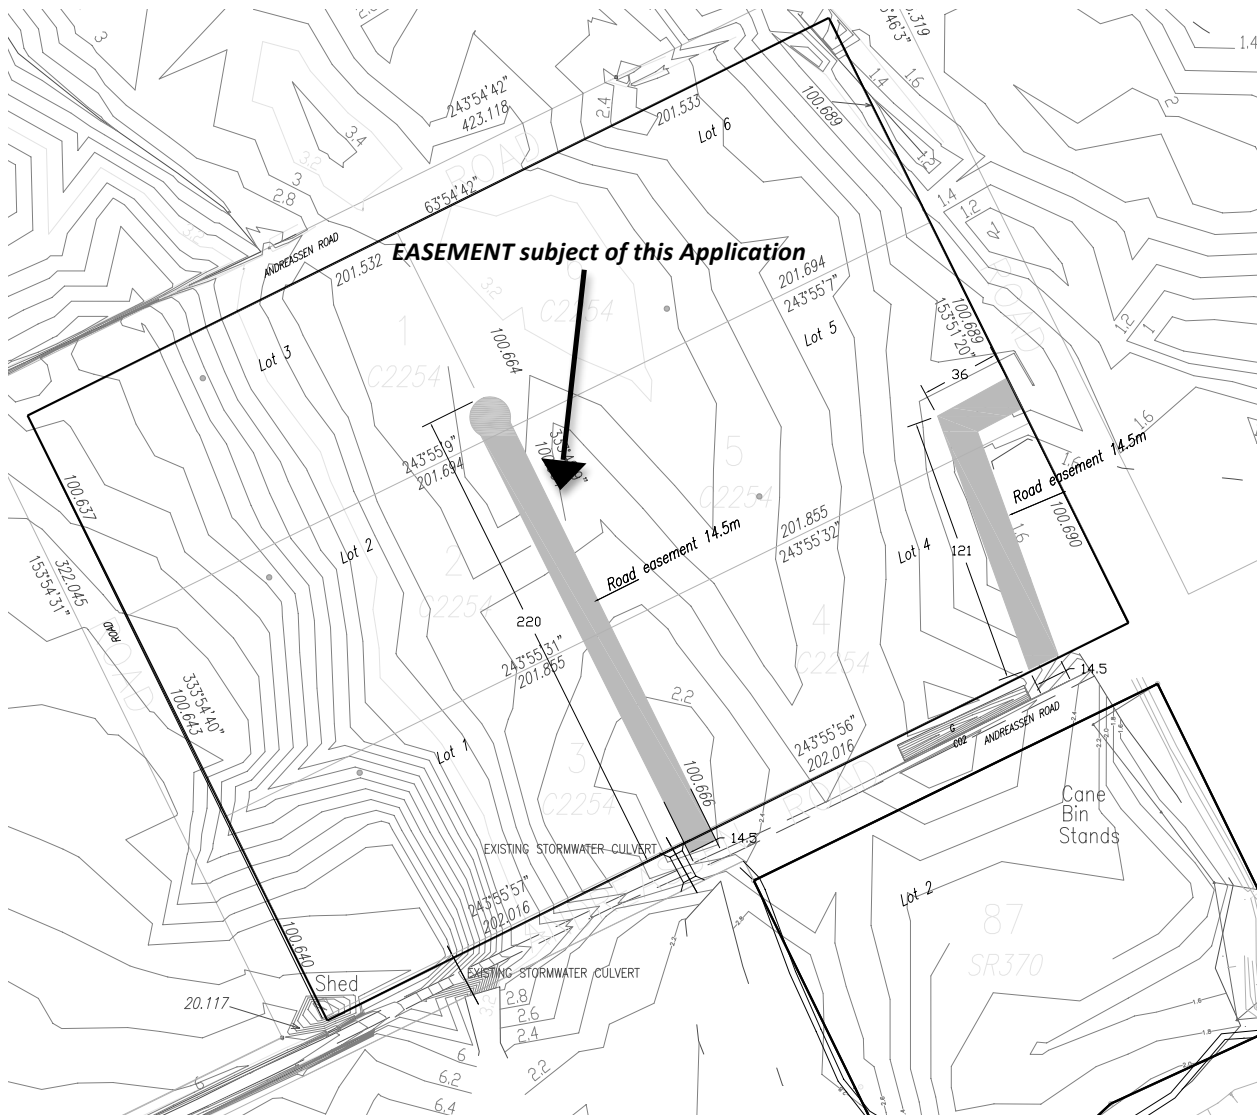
Proposal Plan illustrating Access Easement (Image Courtesy RECS Pty Ltd 2013).
